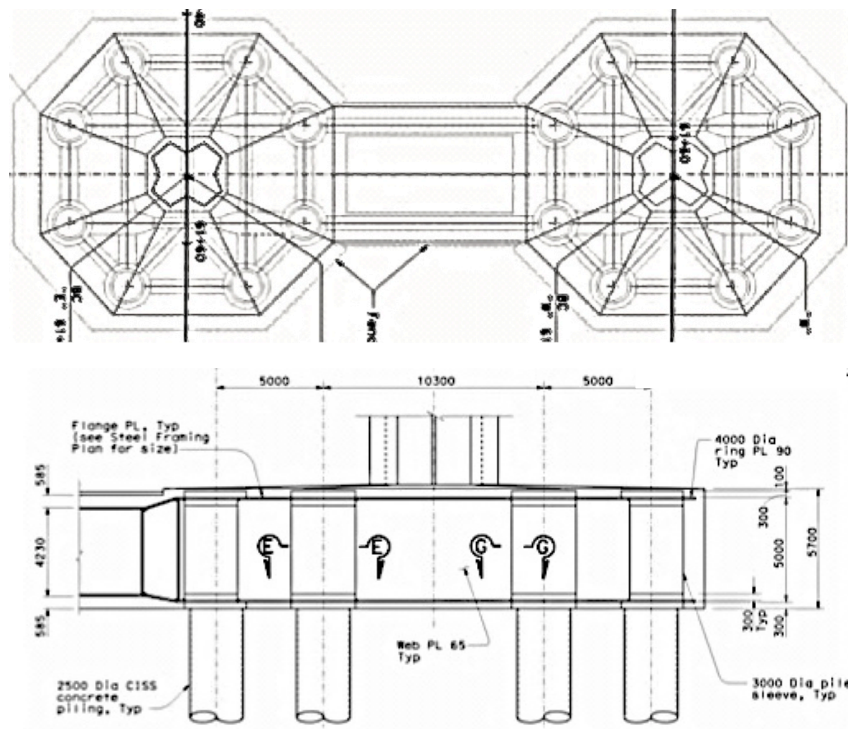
Plan and elevation sections of the East piers and pile cap (Ref.: Caltrans drawings 46/118).
